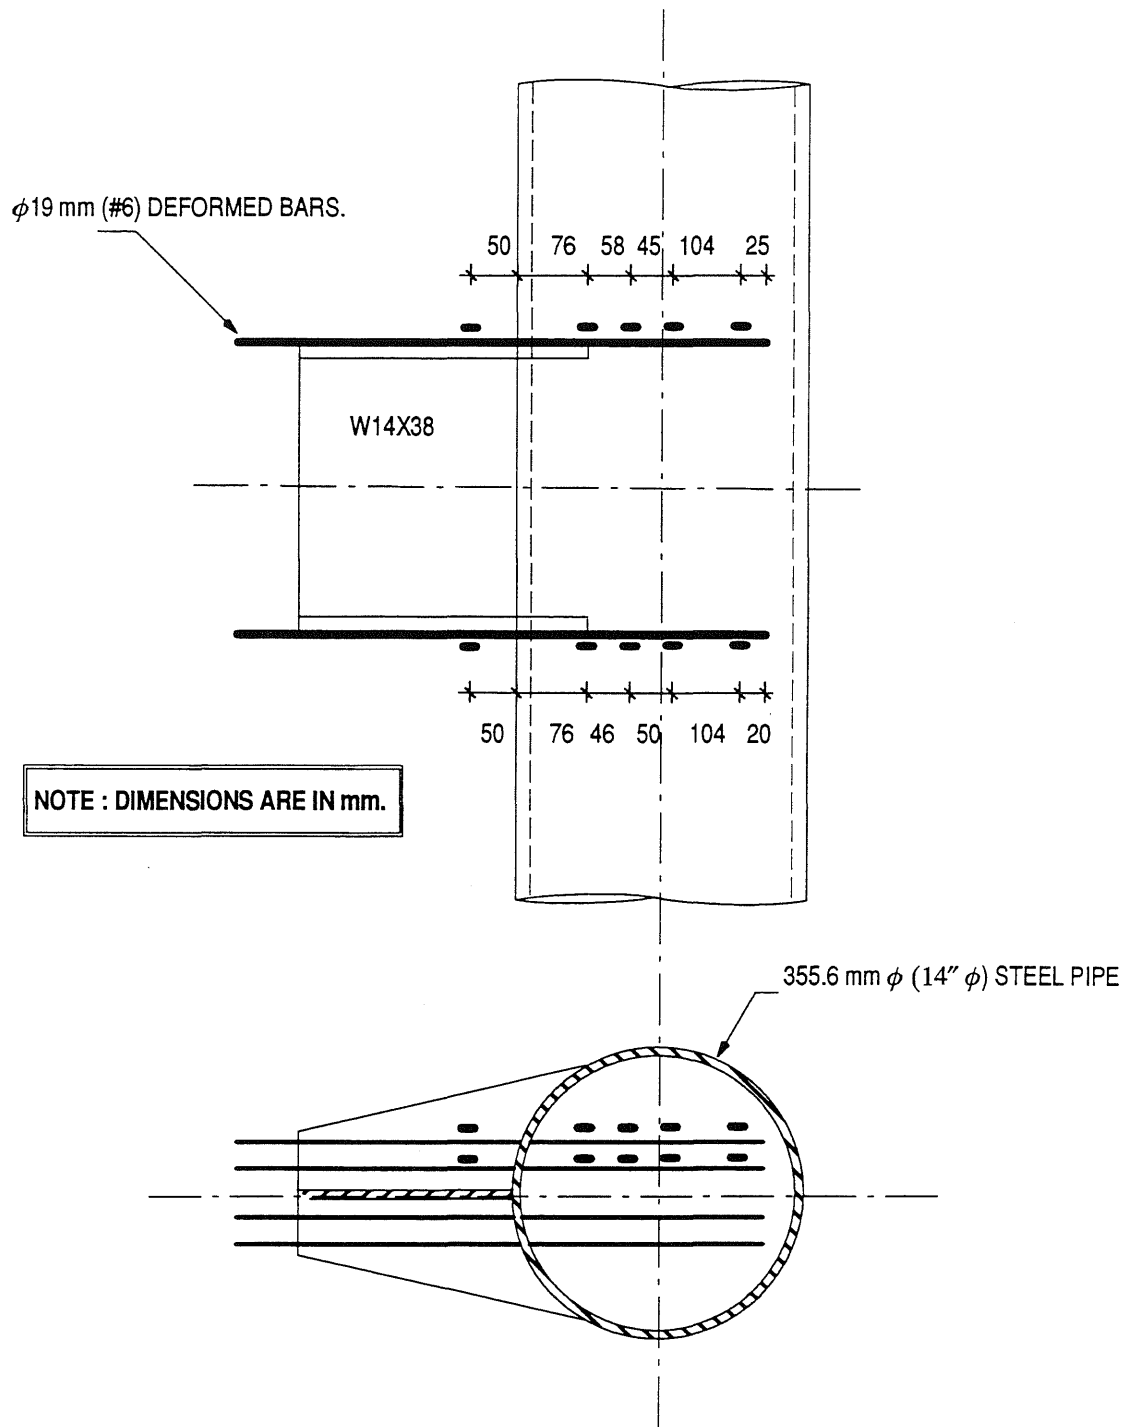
Deformed Bar Instrumentation, Connection *Type III
